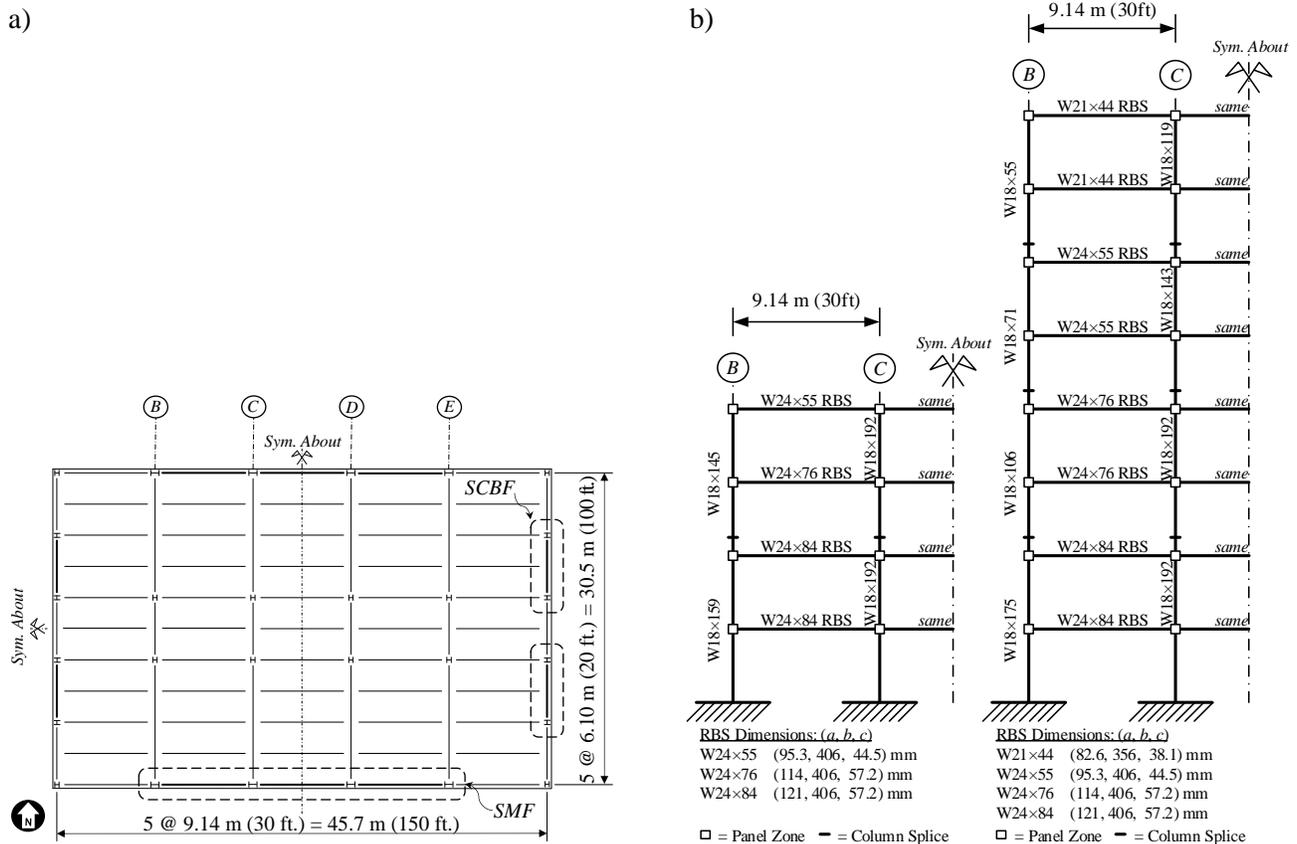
(a) Floor plan and (b) SMF elevations for the archetype buildings used in this study.
